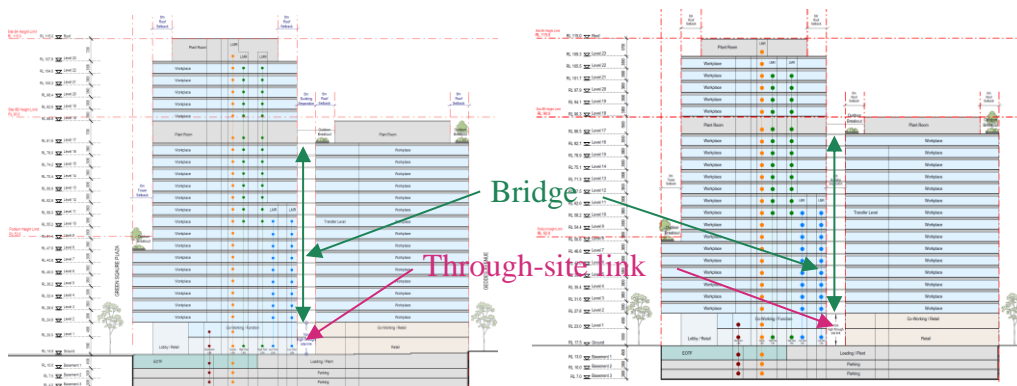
North-south sections looking east– 20 m wide bridge (L), 3 m wide bridge (R)
